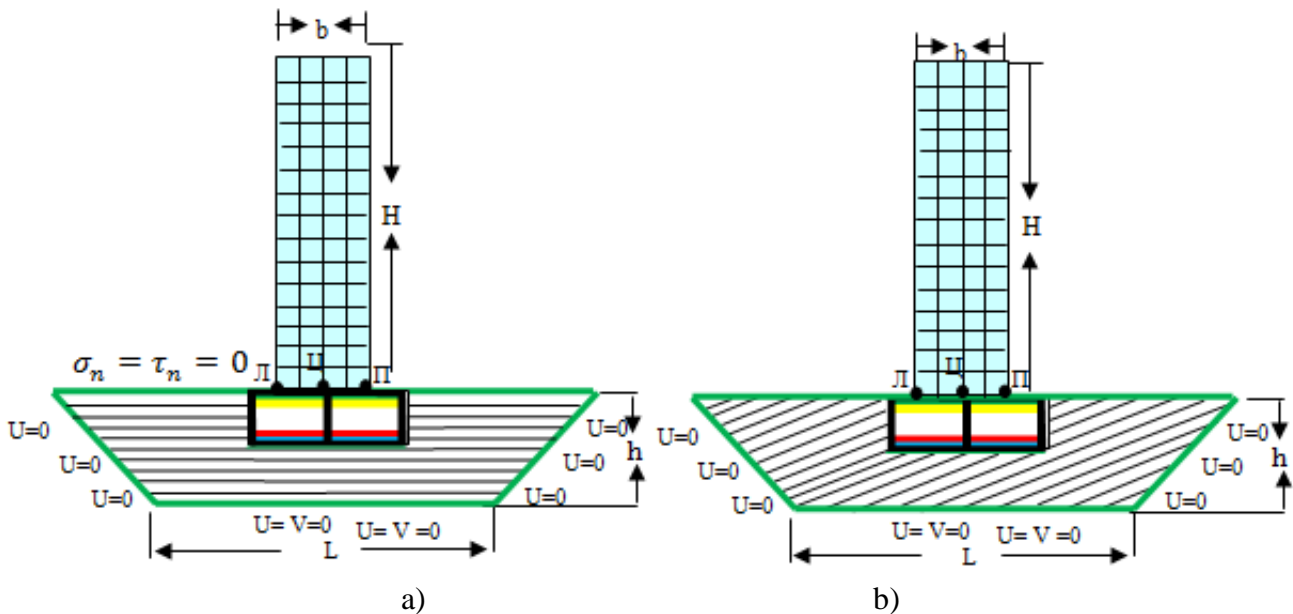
a) horizontally layered variant (left picture) and b) inclined-layered base (right picture)
